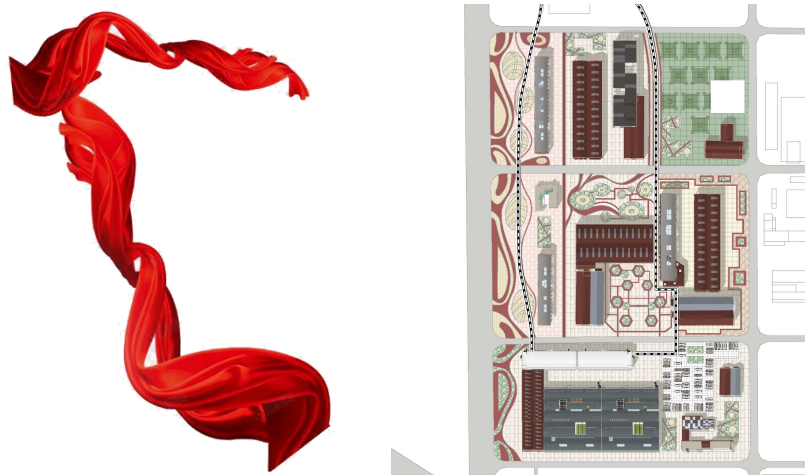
Application of Silk Road Cultural Elements. Source: By Author.
